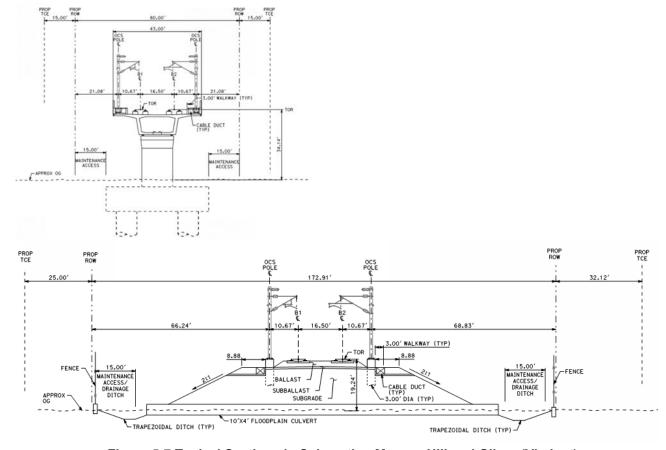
Typical Sections in Subsection Morgan Hill and Gilroy (Viaduct)
